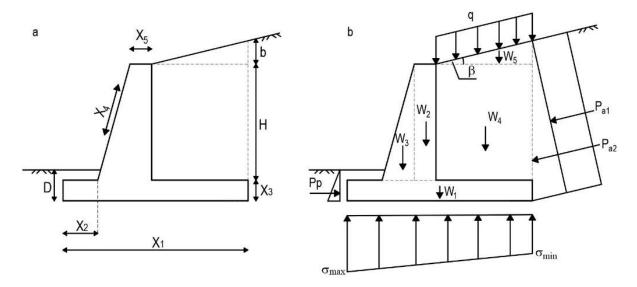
Concrete cantilever retaining wall design: (a) wall dimensions; (b) acting loads to the wall.
